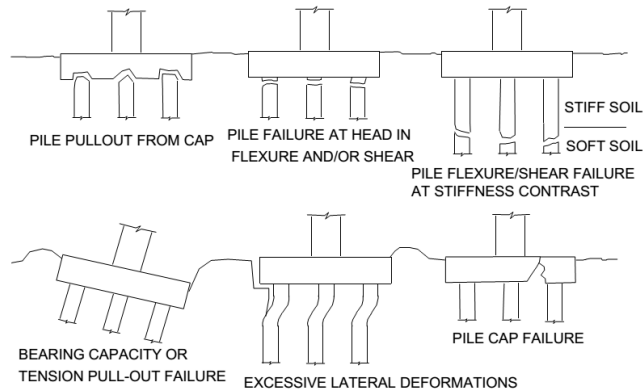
Potential Failure Modes for Pile Group Foundations Subjected to Seismic Shaking
